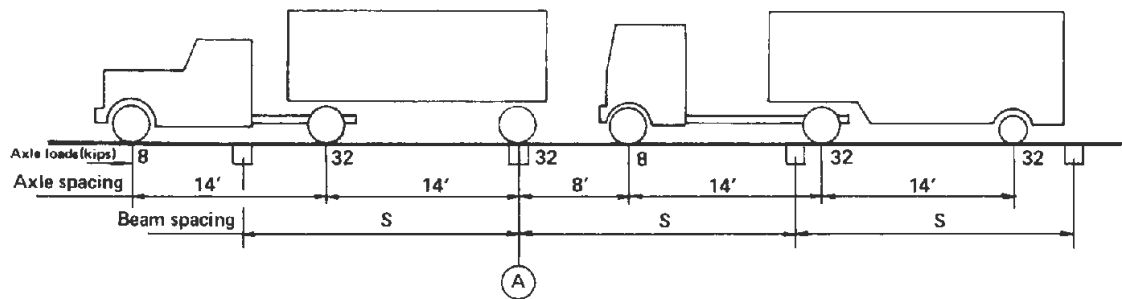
Assumed truck load distribution to structural members spanning transverse to direction of traffic.
